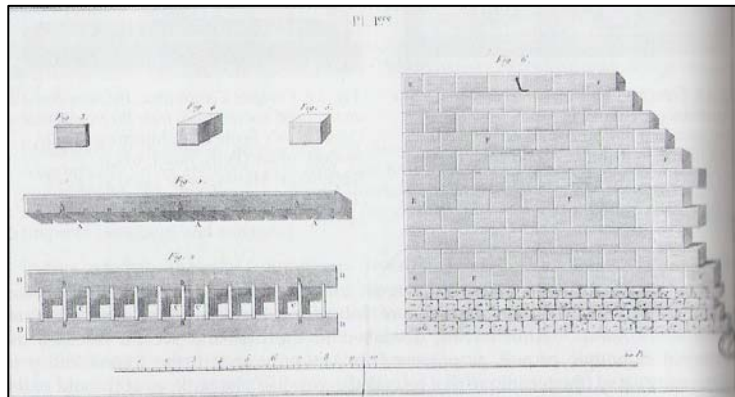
Cointeraux's nouveau pisé. (Image: Louis Cellauro and Gilbert Richaud)
